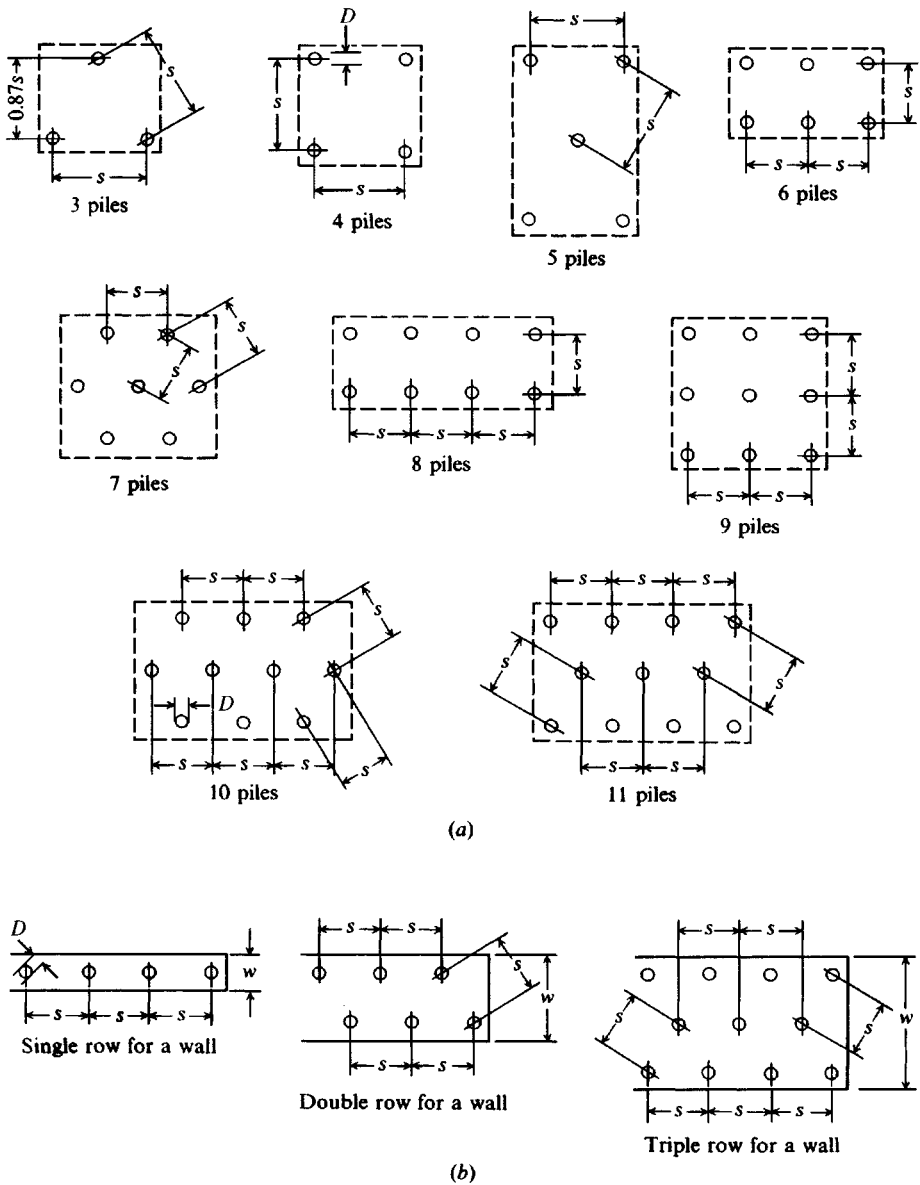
Typical pile-group patterns: (a) for isolated pile caps; (b) for foundation walls.
